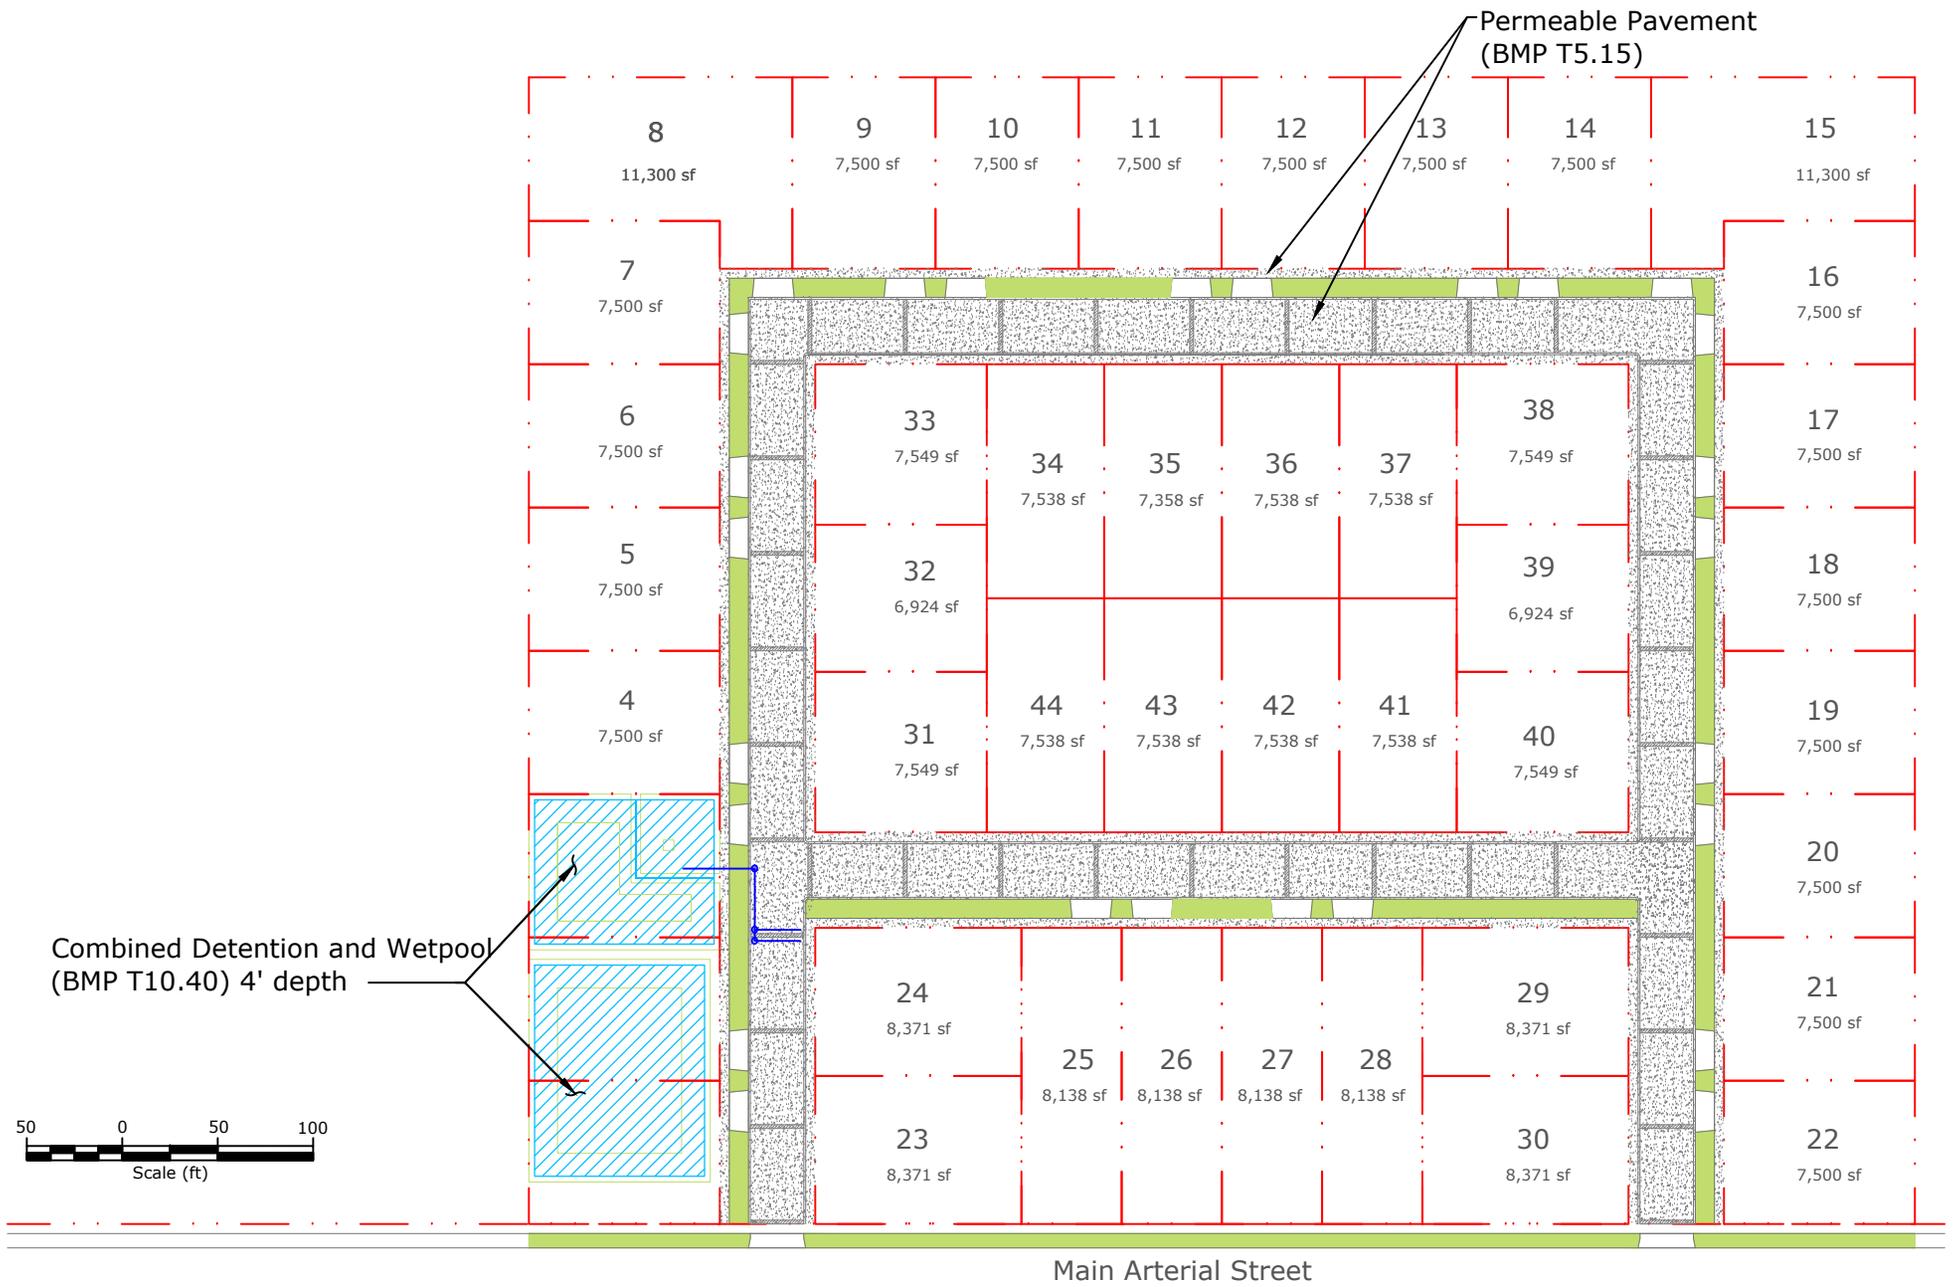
Scenario 4. Permanent Stormwater Site Plan - Typical Single-Family Residential Development, 2012 Requirements, Till Soils
